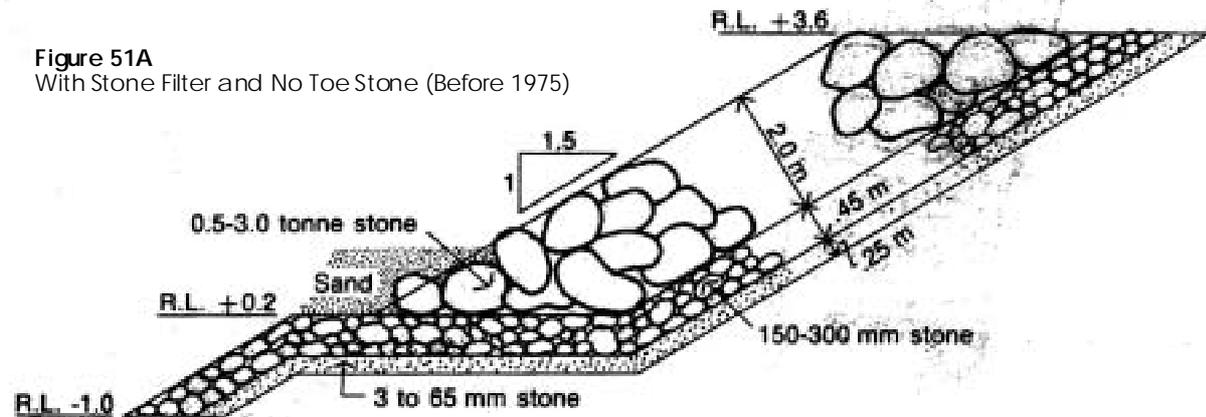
RIP-RAP SEAWALL CONSTRUCTION
